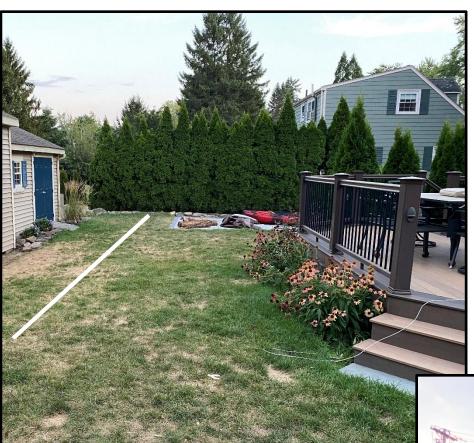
Lawn area between deck and shed. White line shows impracticality of moving shed even 5' forward (which would still be in violation).
